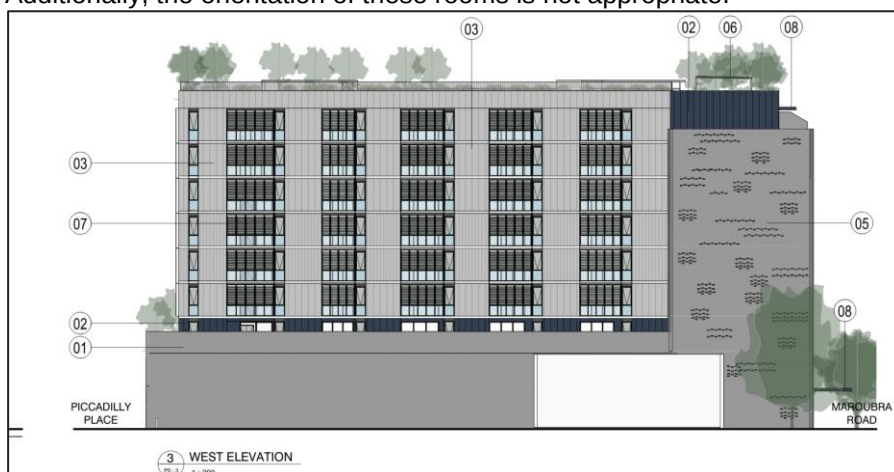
Western Elevation showing the configuration of the proposed balconies (Source: Applicant)
